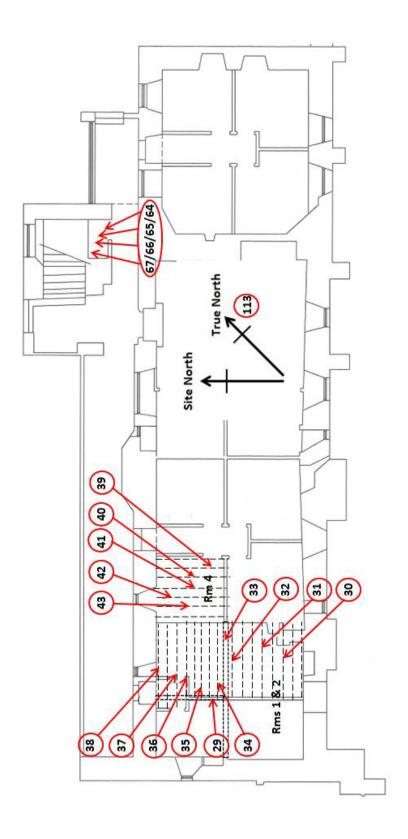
Ground-floor plan to locate samples from the Bedesman rooms and the under-stair cupboard (after HBMC 1986)
